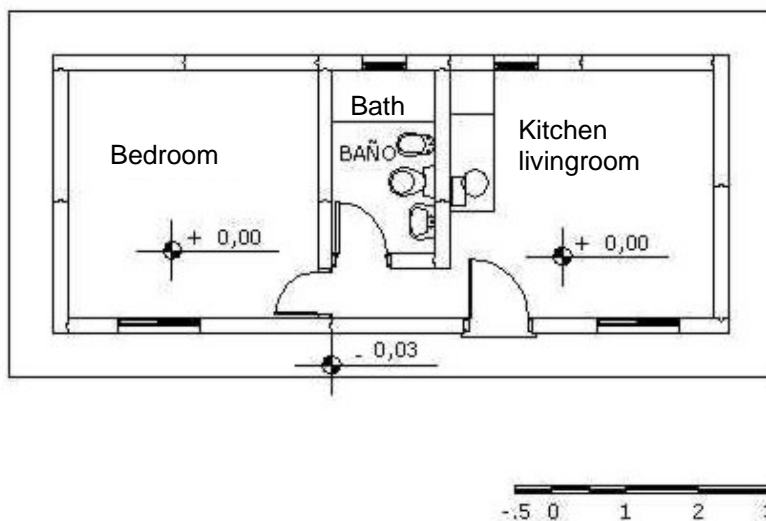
Plan of the prototype house (Patrone, 2006).
